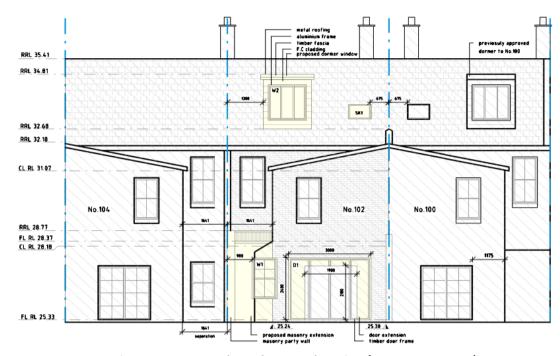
Proposed South West Elevation (D.A - 104 Issue A)
